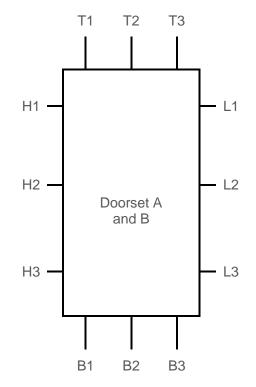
Clearance measurements, Doorset A and B (unexposed side shown)
